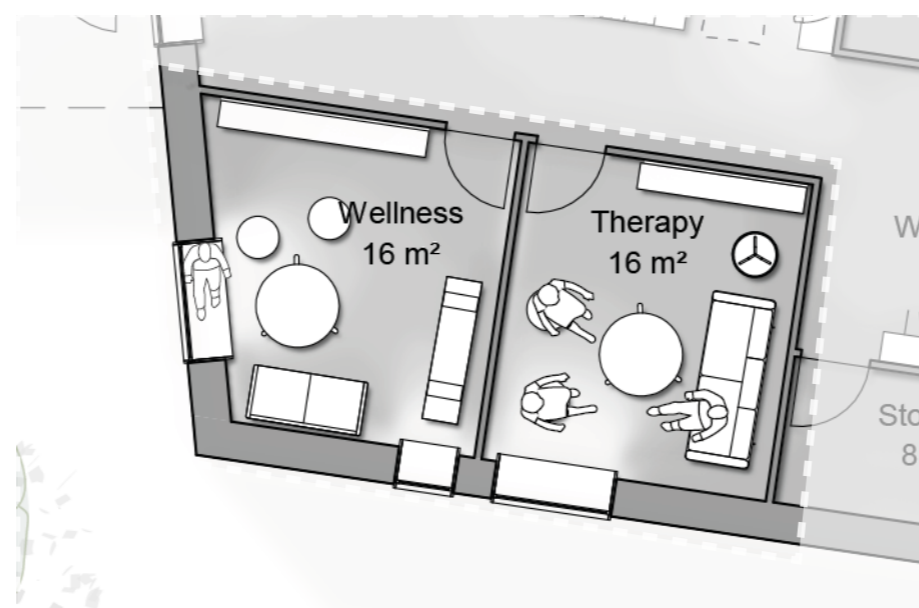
Plan zoom in 1:100, larger therapy room and wellness
